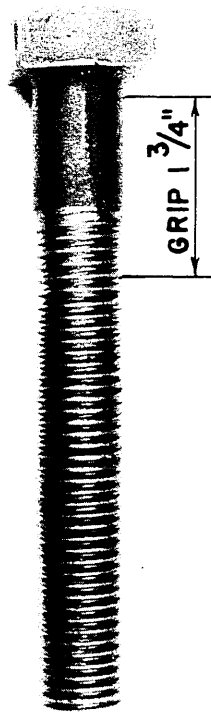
BOLTED TEST SPECIMENS, BOS SERIES
